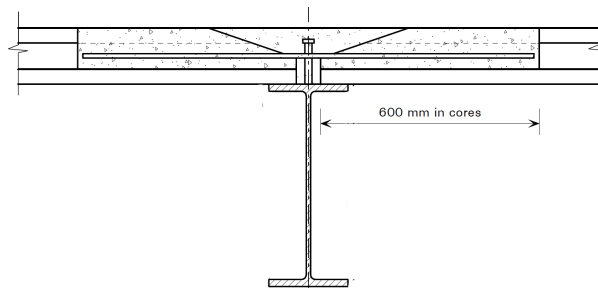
Detailing requirements for transverse reinforcement for a 60 minute fire rating (Hicks and Lawson, 2003)
